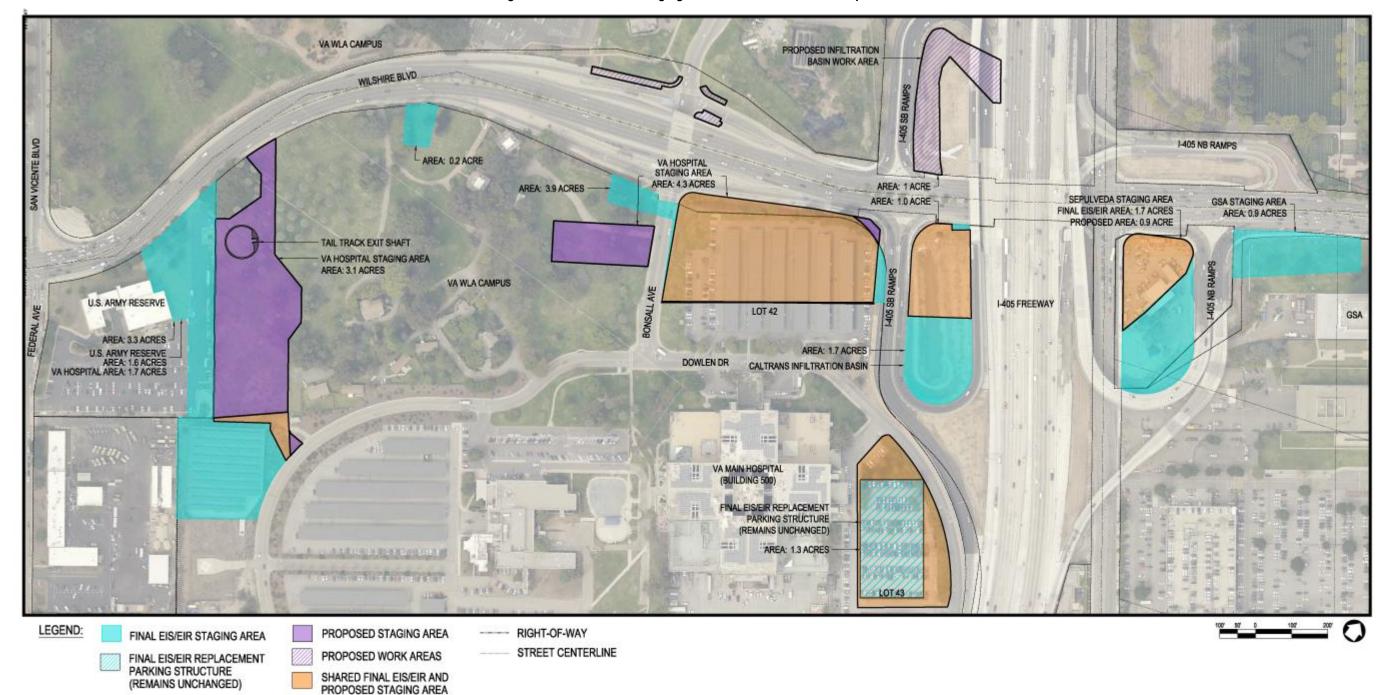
Construction Staging Areas – Final EIS/EIR and Proposed
